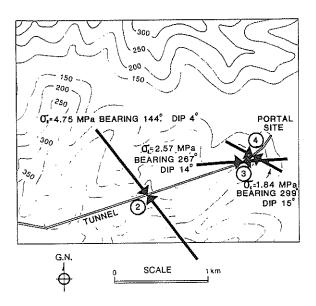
Boomerang Creek. Plan showing topographic contours. Sub-horizontal stresses at three overcoring test sites are indicated.
